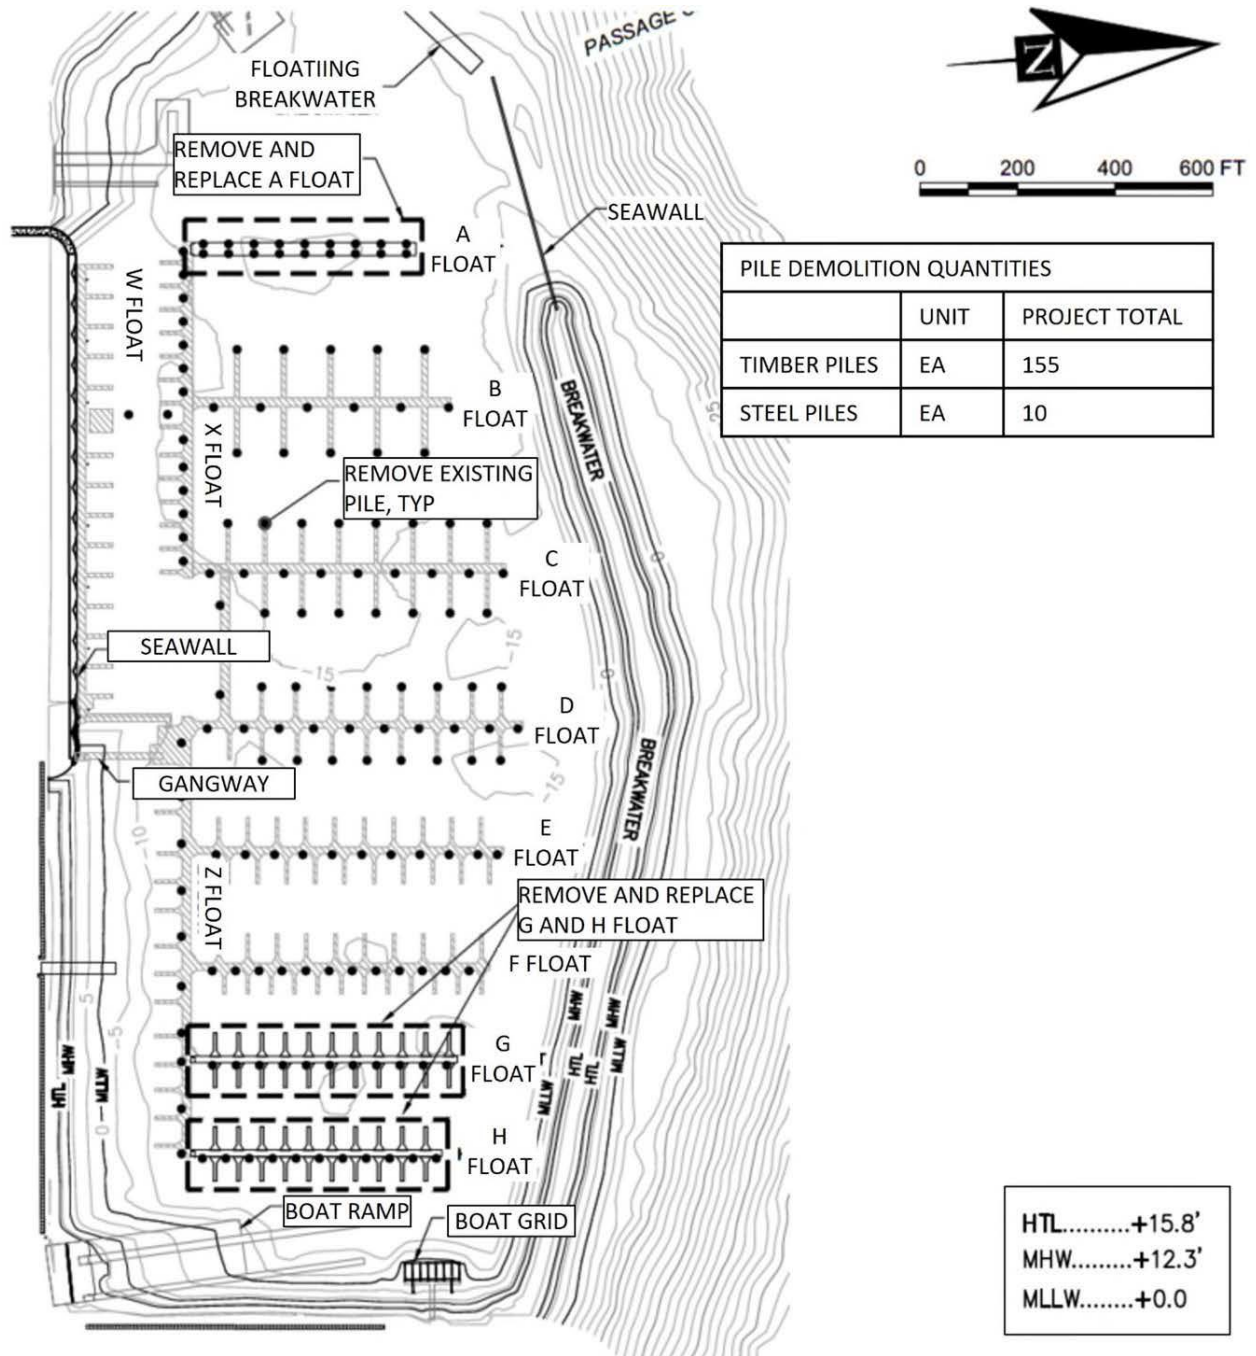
Site plan showing existing Whittier small boat harbor components to be removed and site layout (SolsticeAK 2025).
